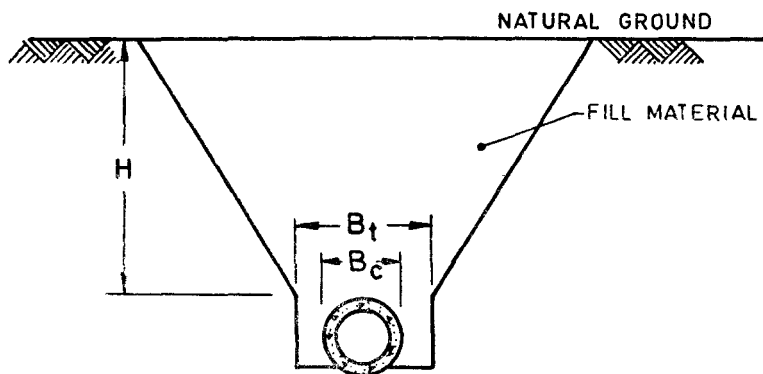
INSTALLATION CONDITIONS OF UNDERGROUND CONDUITS — *Contd
